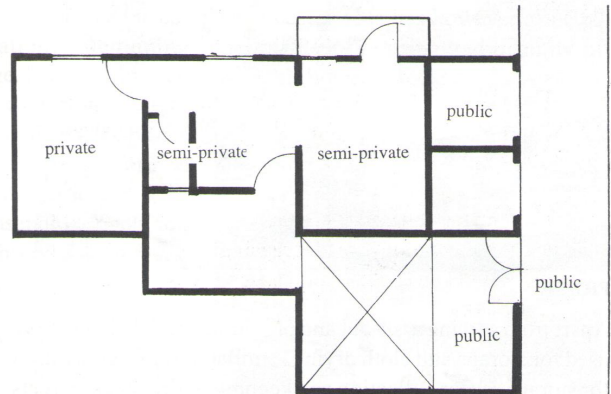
Domain analysis of typical building on site (Floor plan A)
